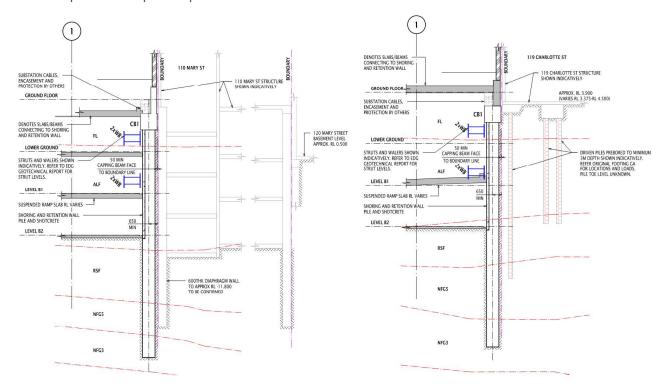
Typical Boundary Section – 110 Mary Street and 119 Charlotte Street
